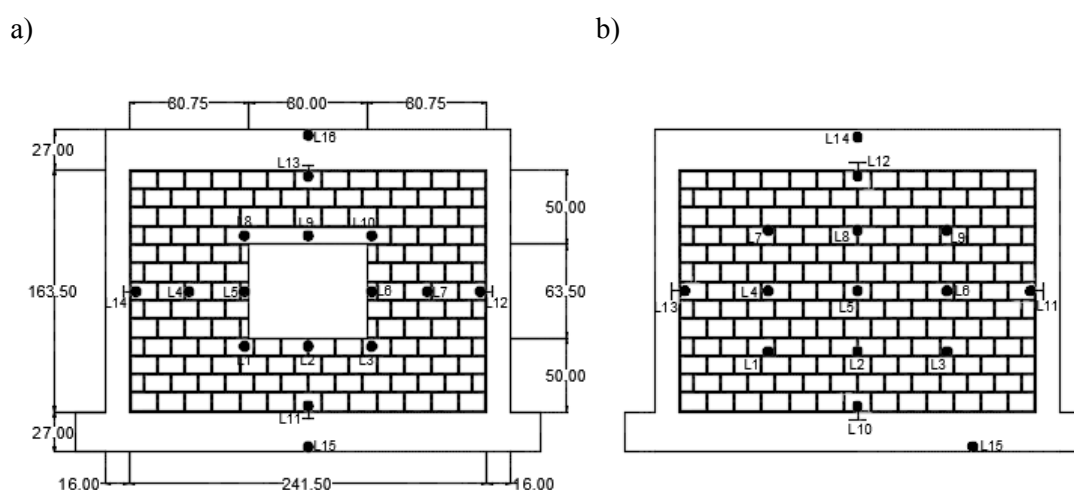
Instrumentation for out-of-plane testing; a) infill wall with a central opening; b) solid infill walls
